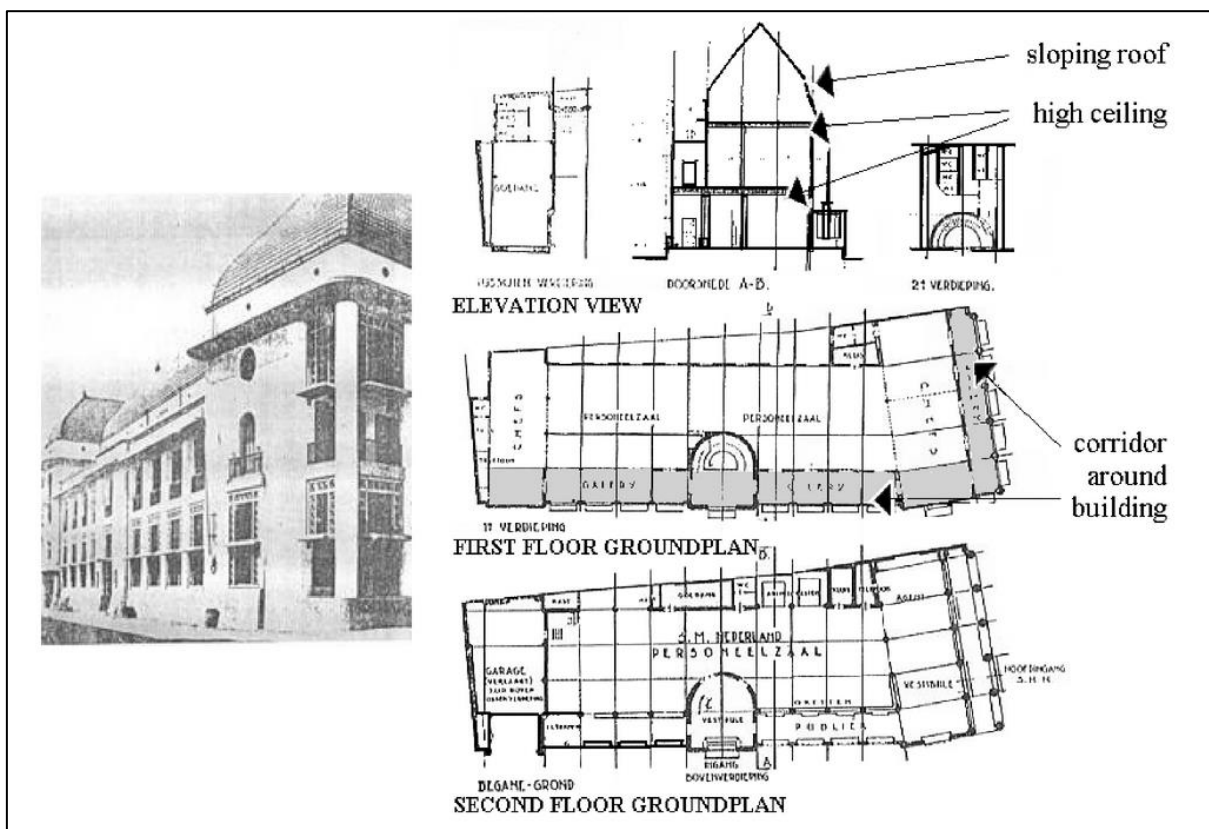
Colonial housing in Semarang, Java Island (floor plans show corridor feature); source: Prianto et al (2000, p.84).
